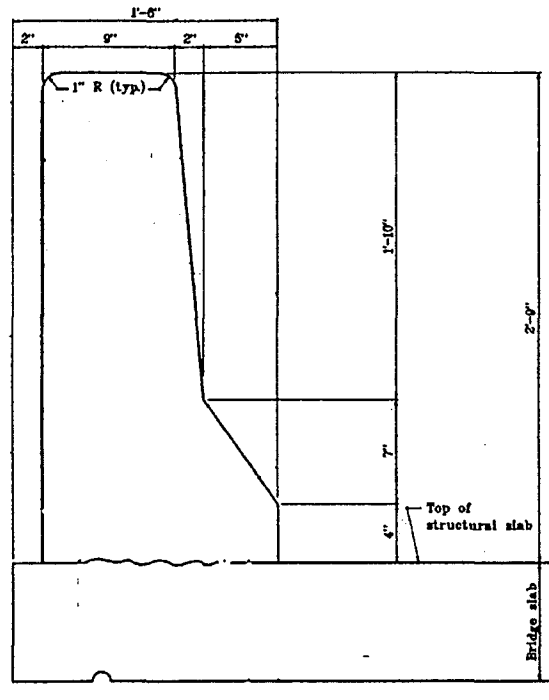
Indiana 2'-9" Concrete Bridge Railing Cross-Section
